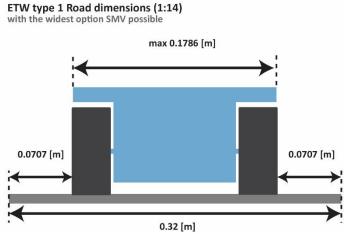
ETW type 1 road dimensions scaled down (1:14)
